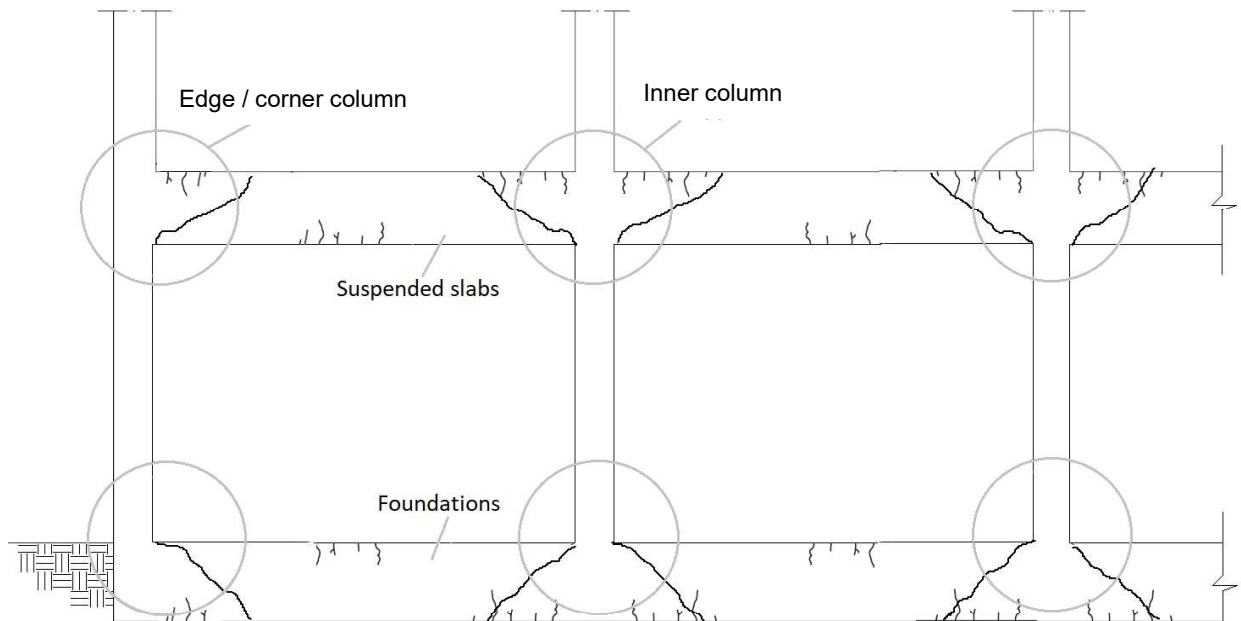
Schematic representation of locations on a reinforced concrete frame where punching shear reinforcement might be required (either from the top or bottom of the given concrete member).
